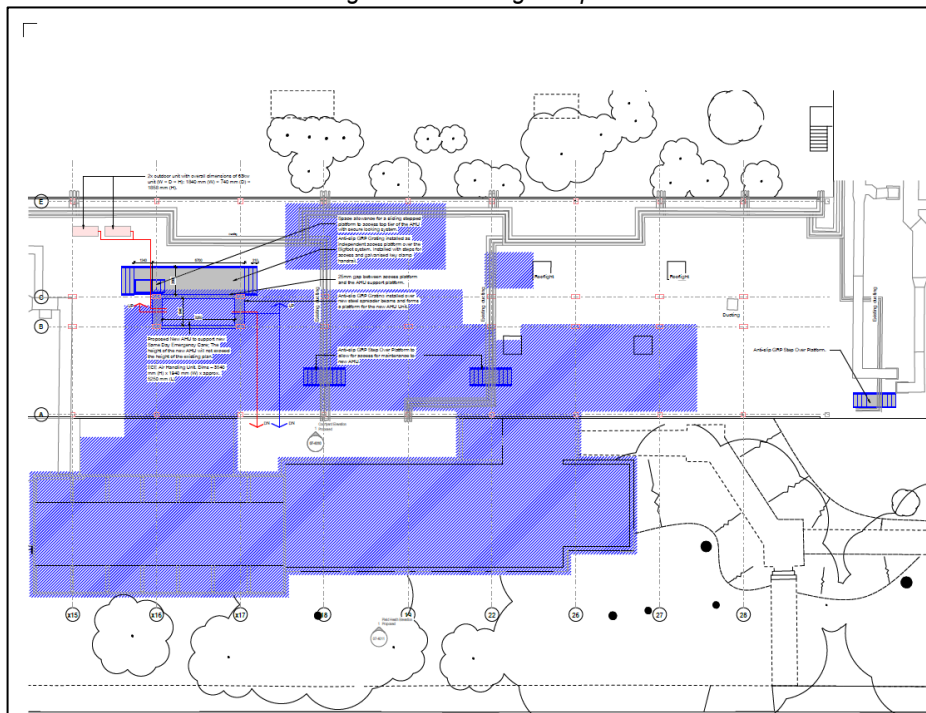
Proposed roof plan showing the proposed new AHU and access platform
